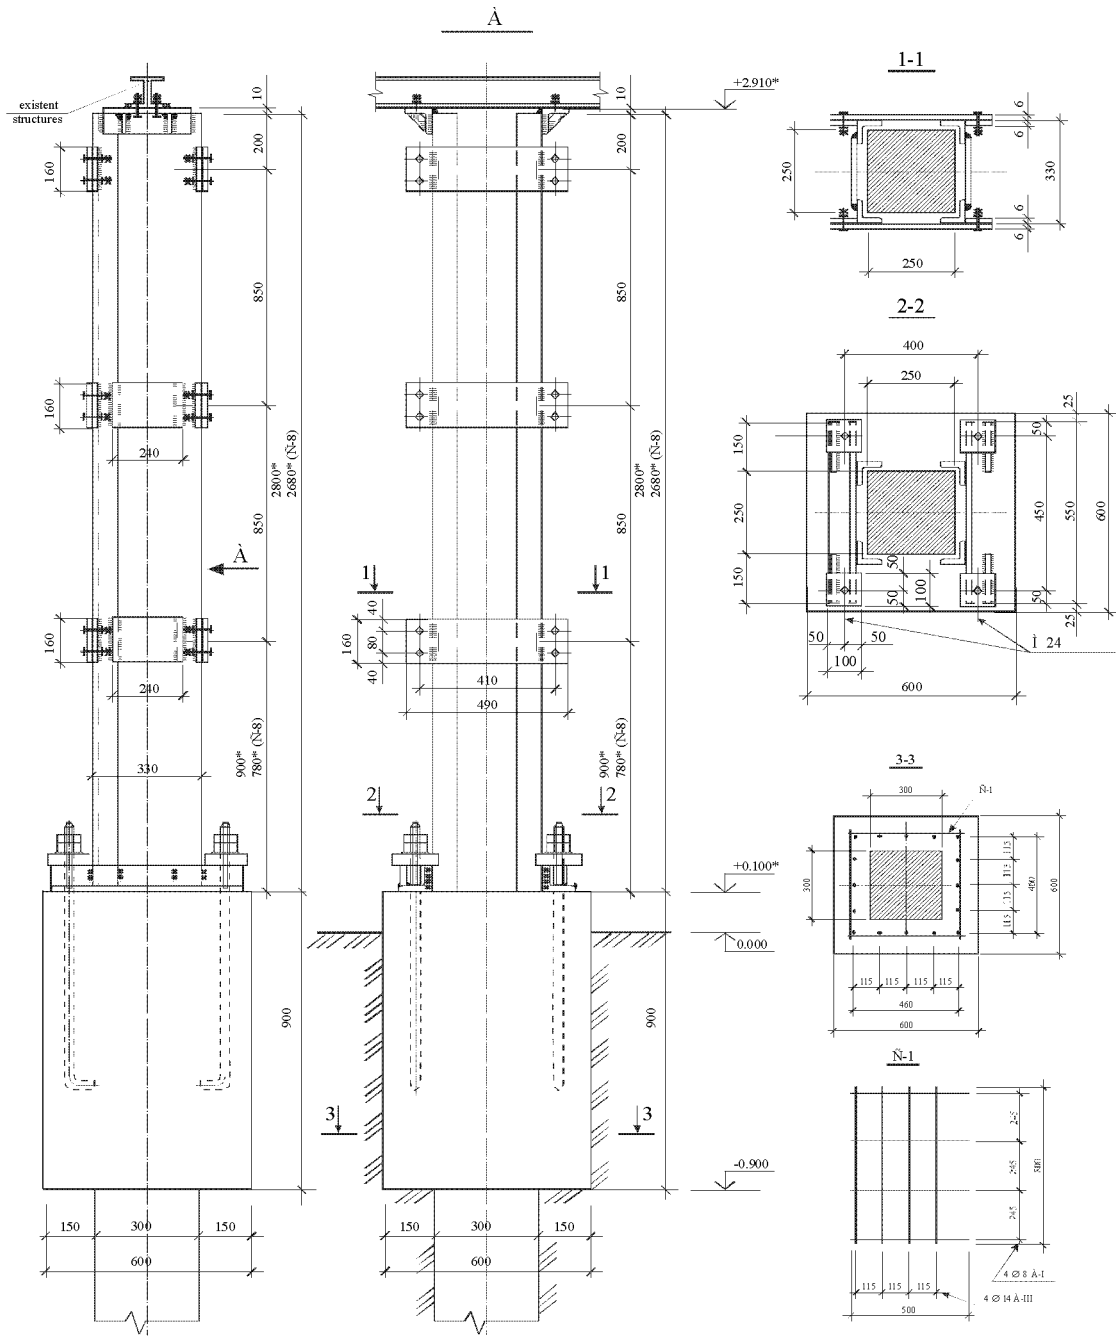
The scheme of a structure for strengthening with a steel collar.
